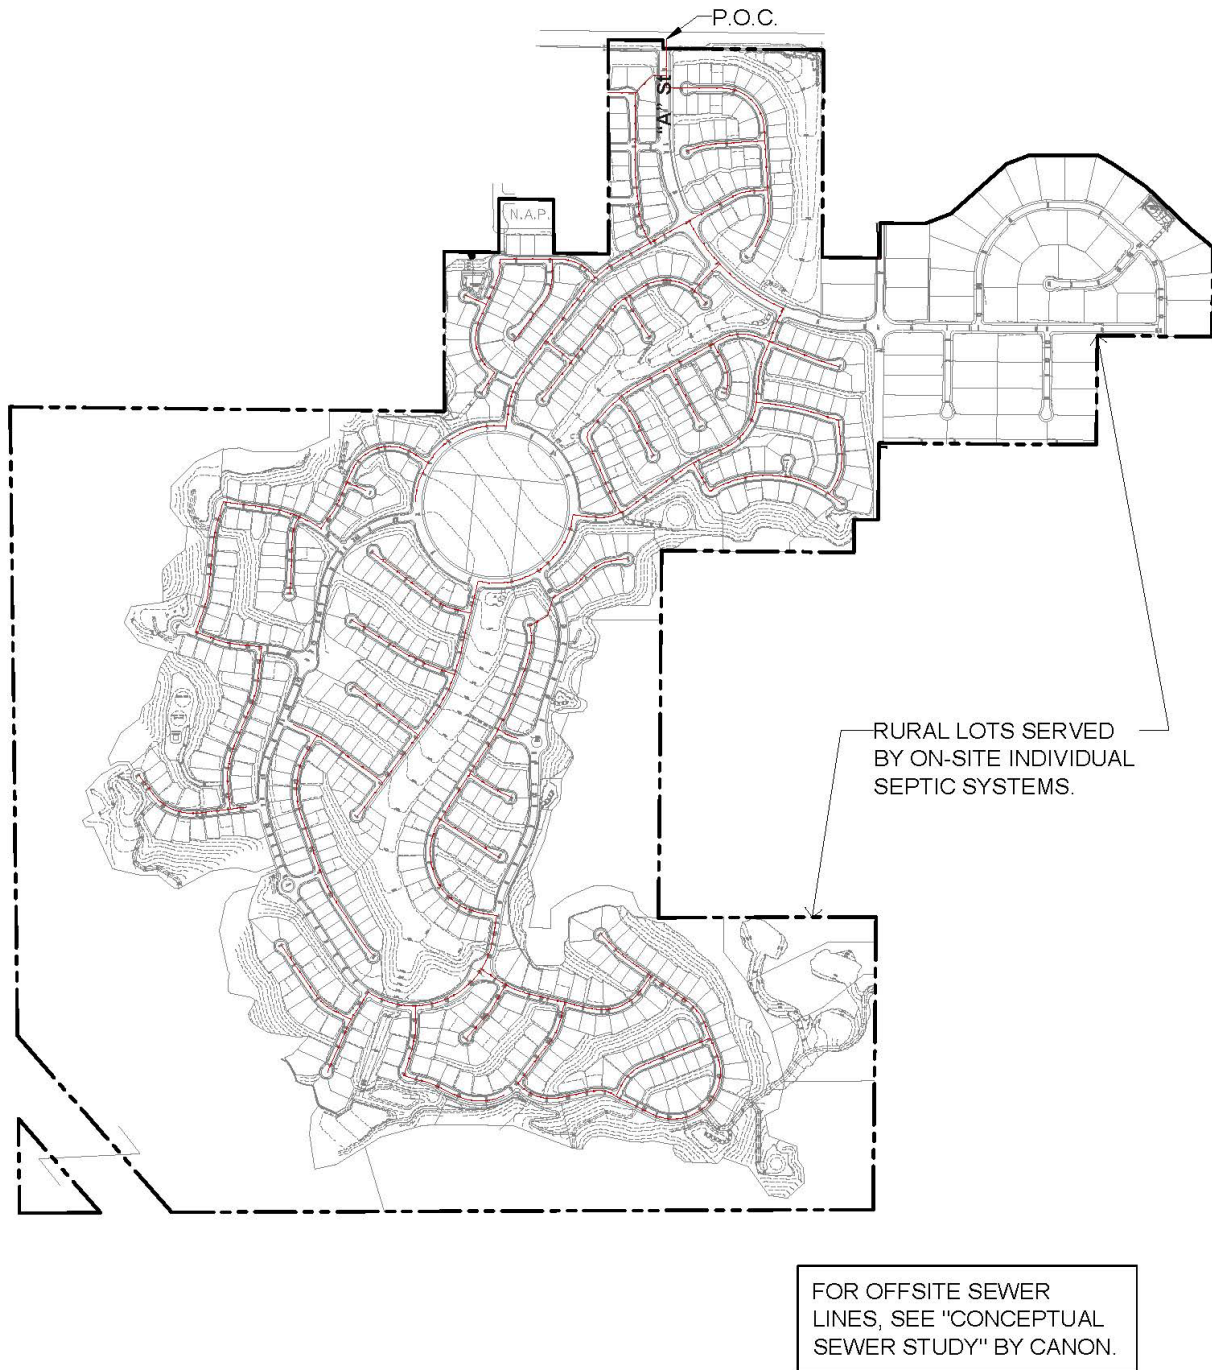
CONCEPTUAL SEWER SYSTEM PLAN
